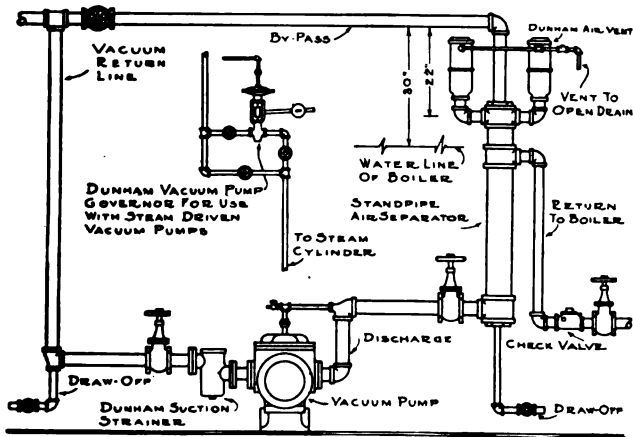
METHOD OF DISCHARGING DIRECT FROM VACUUM PUMP INTO BOILER
